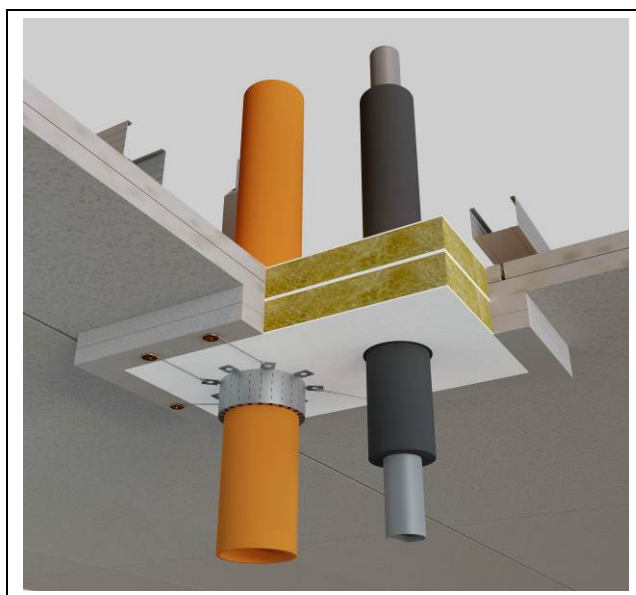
Example of AF PANEL seal in a timber floor.
